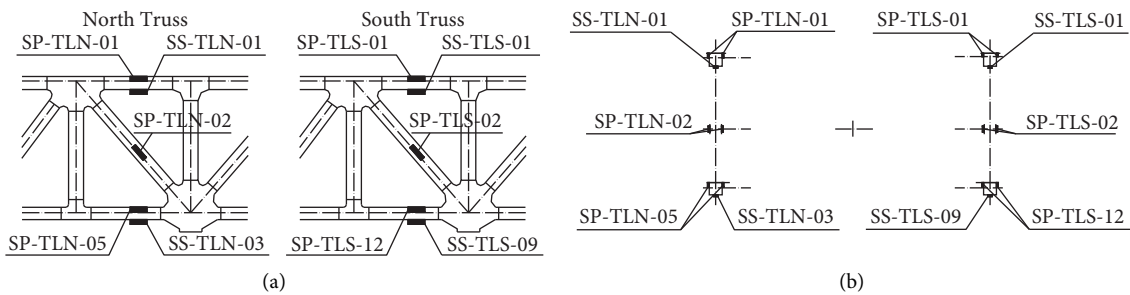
Deployment of strain sensors on longitudinal trusses. (a) Elevation view. (b) Cross-sectional view.
